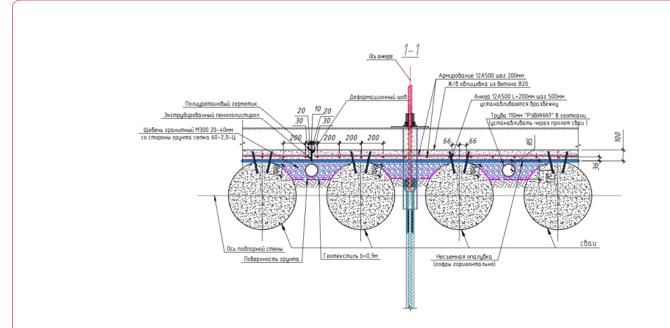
A fragment of a monolithic reinforced concrete fence with an indication of the attachment point of the soil anchor ERT.
